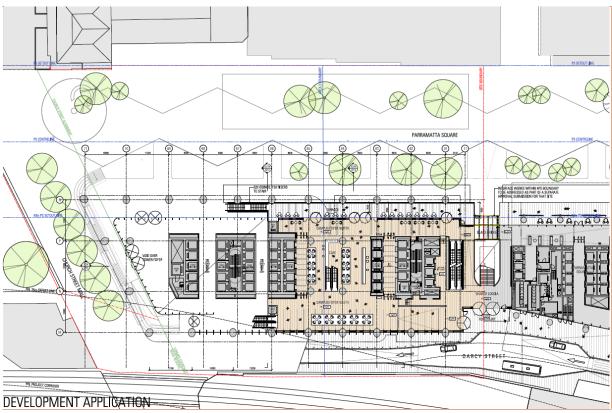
Terrace and stairs – Upper Ground (Lobby)
